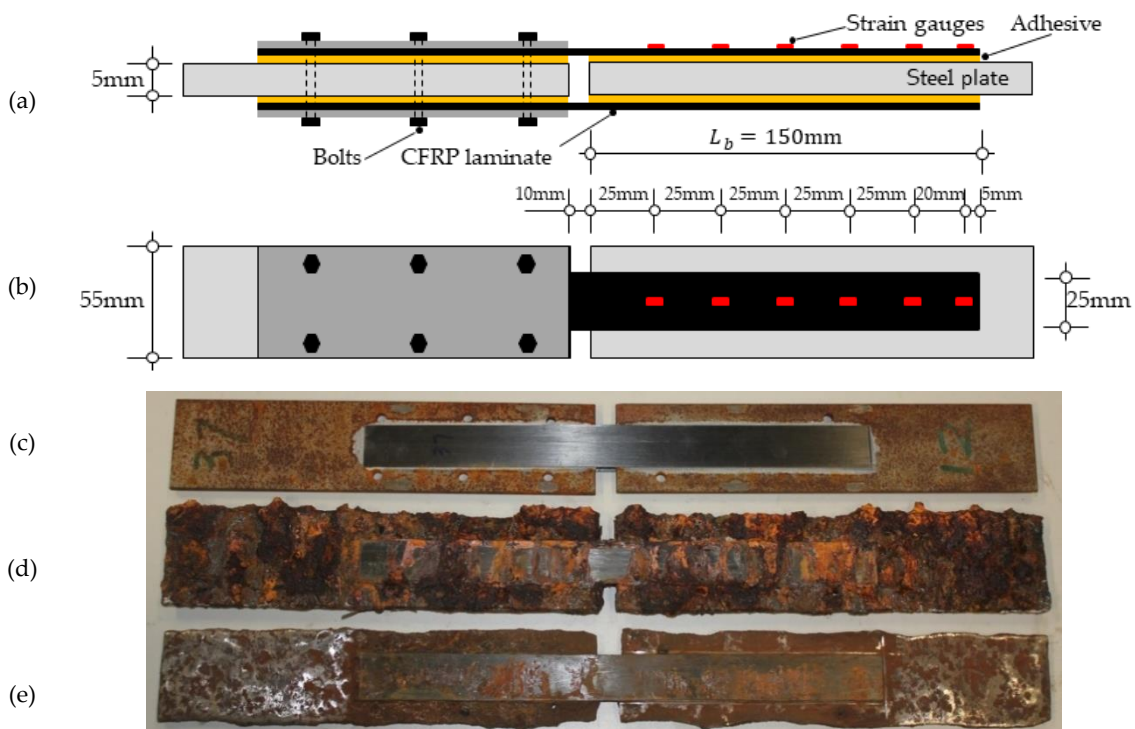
Schematic view of bonded joints: (a) side view; (b) front view; and images of bonded joints with: (c) reference; (d) corroded; and (e) cleaned.
